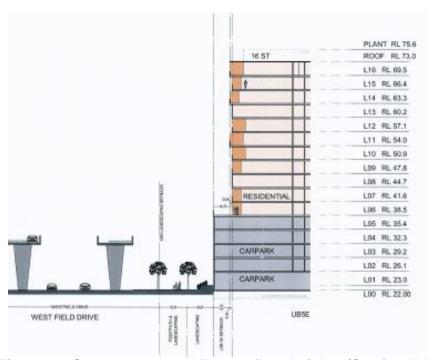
Stage 1 approved floor to floor heights (Section H-H)
